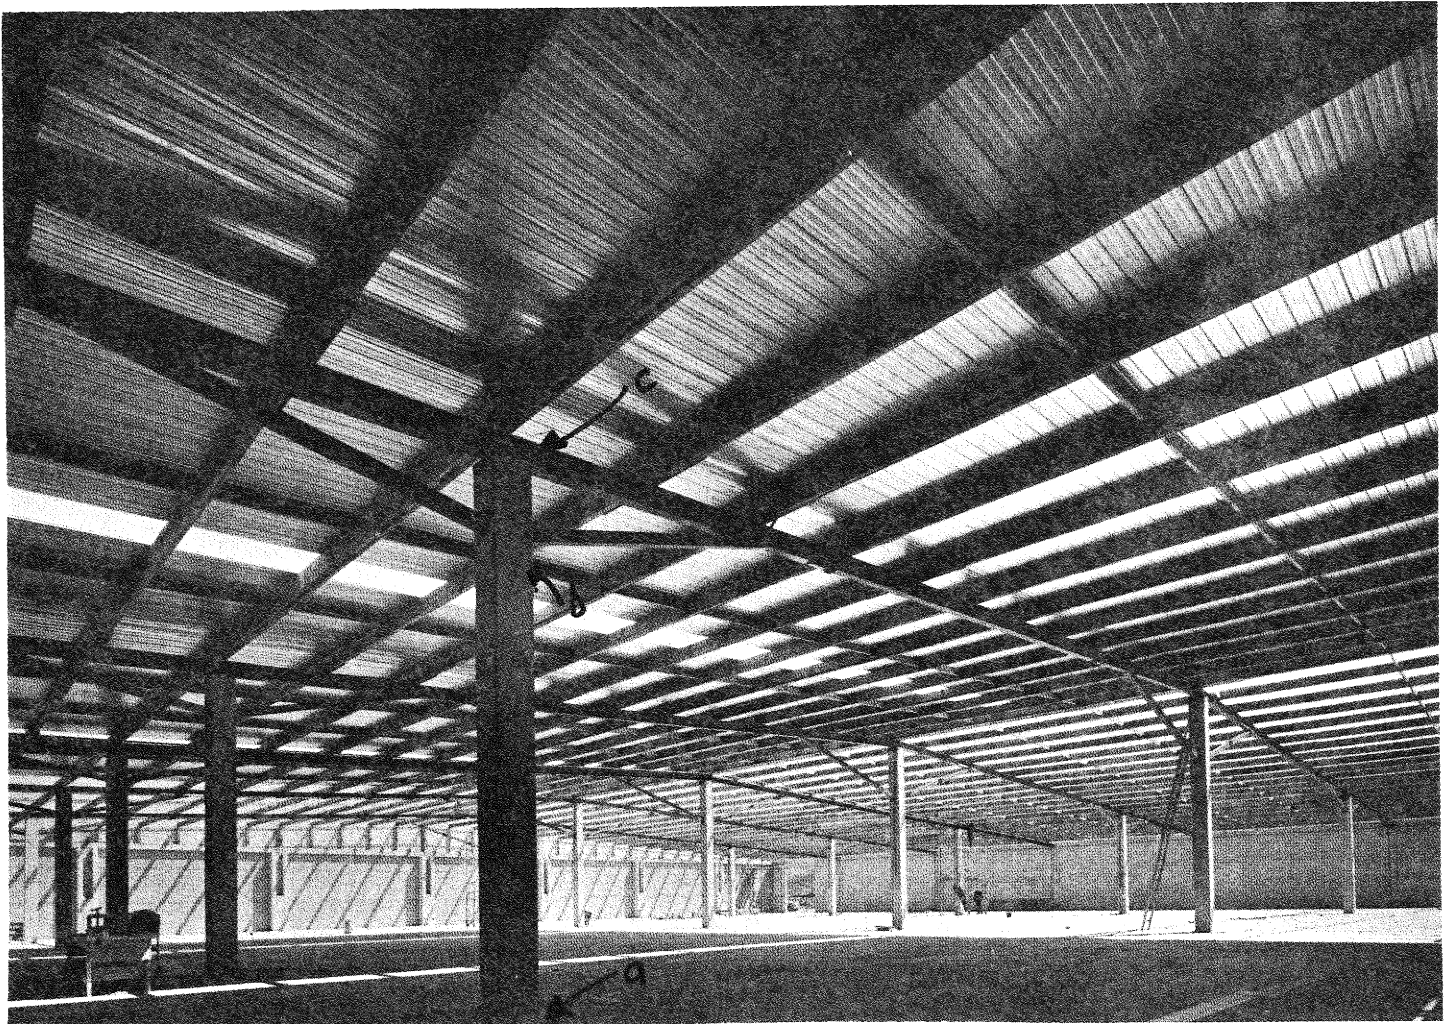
Example of type of detailing needed to avoid failure between hinges.
